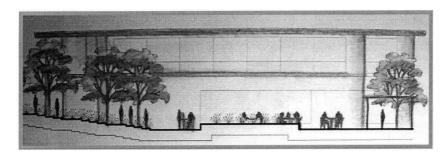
Portion of section/elevation I-I1 looking at the Heritage House Plaza with outdoor seating and ornamental plantings
